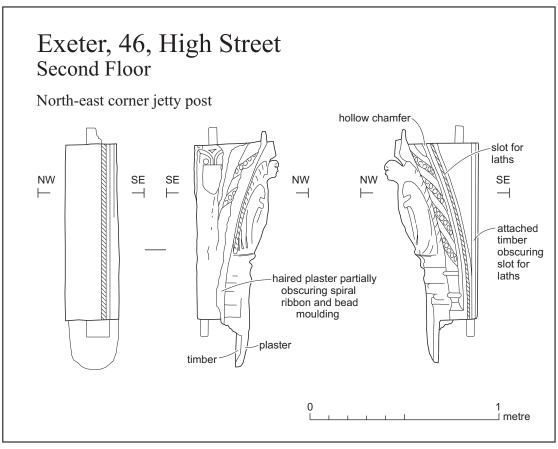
Detail of the second-floor north-east corner post and jetty bracket with attached angel casting after removal. Scale 1:20
